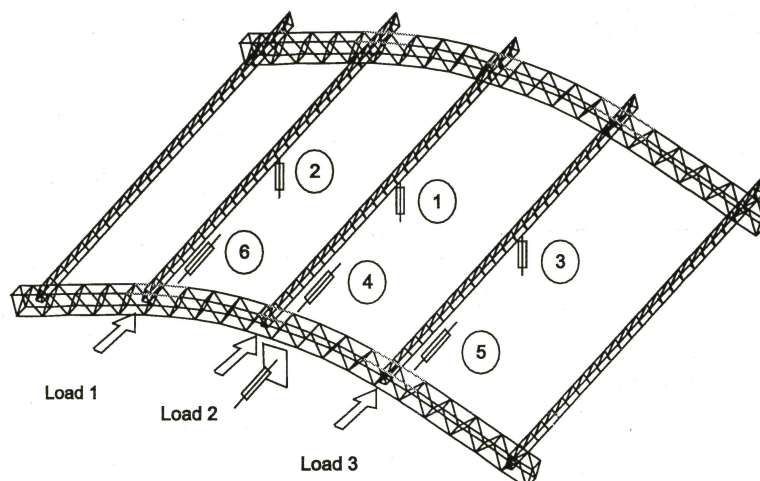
Test setup for Lateral load application on Arch structure with proposed purlin.
